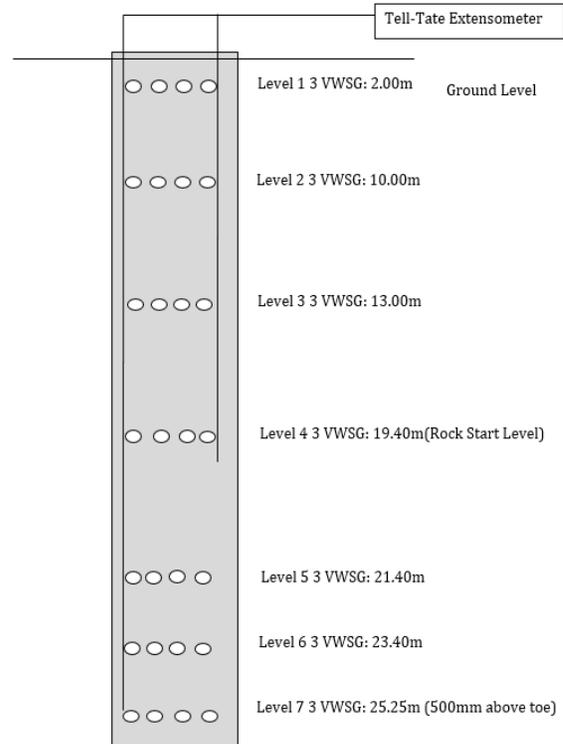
Typical strain gauges installation locations of instrumented static load test
